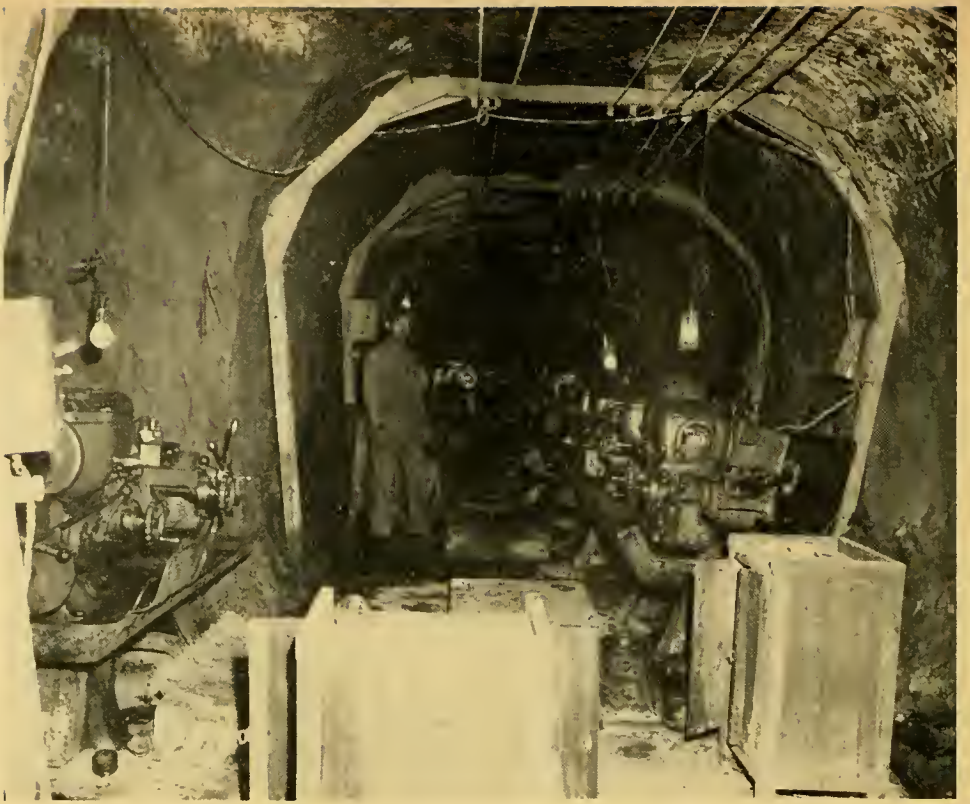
Handa plant. Tunnels in sand mines near Tsu City.
